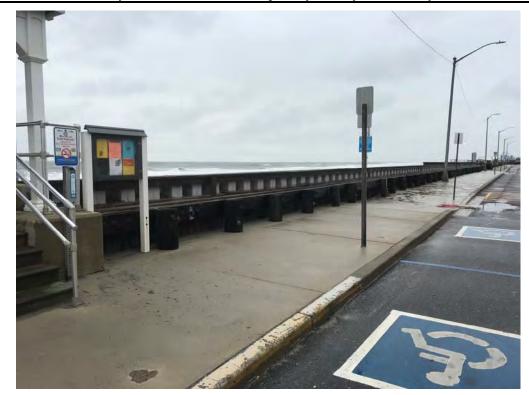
View of landward side of vinyl bulkhead at 3rd Avenue looking southwest.
